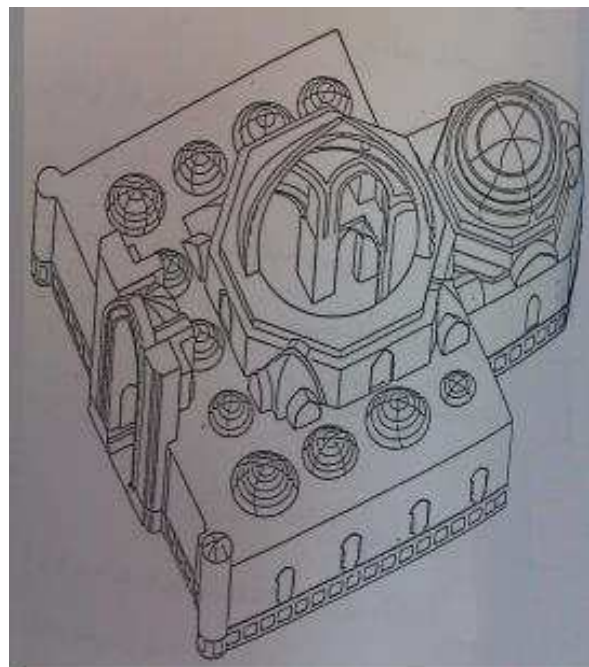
rectangular prism form of the Kabood Mosque [11]
